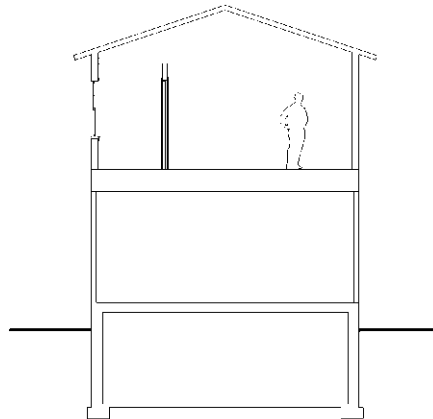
Extending the first-floor walls and adding a standard 4/12-pitch roof truss with an 8-foot flat ceiling provide the needed space at the lowest possible cost, but the result is visually awkward and out of place.
